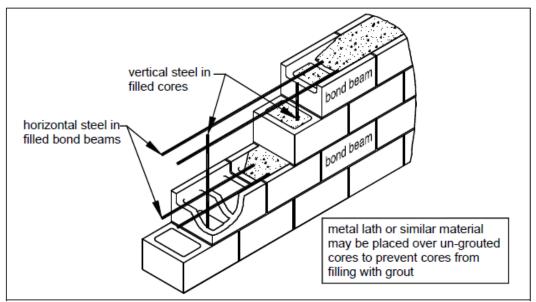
TYPICAL WALL REINFORCEMENT DETAIL
